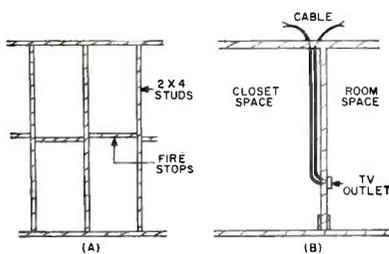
Firestops (A) hamper vertical running of cables. However, closet space (B) can be used to hide wiring, with outlet on room wall of closet.
